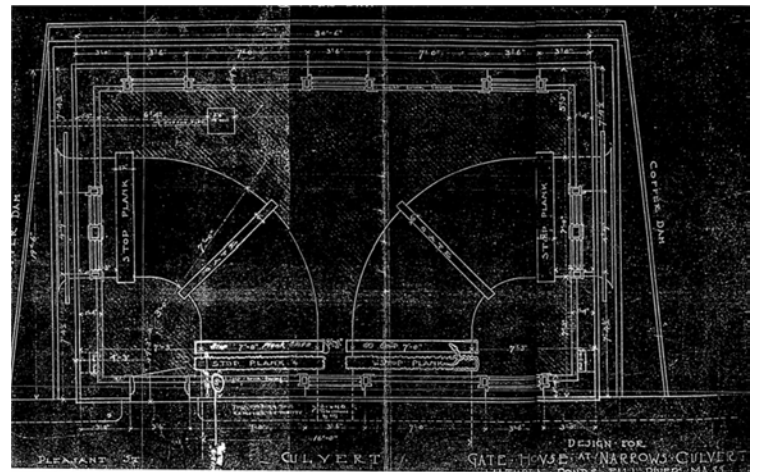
1903 Narrows Gatehouse Blue Print
